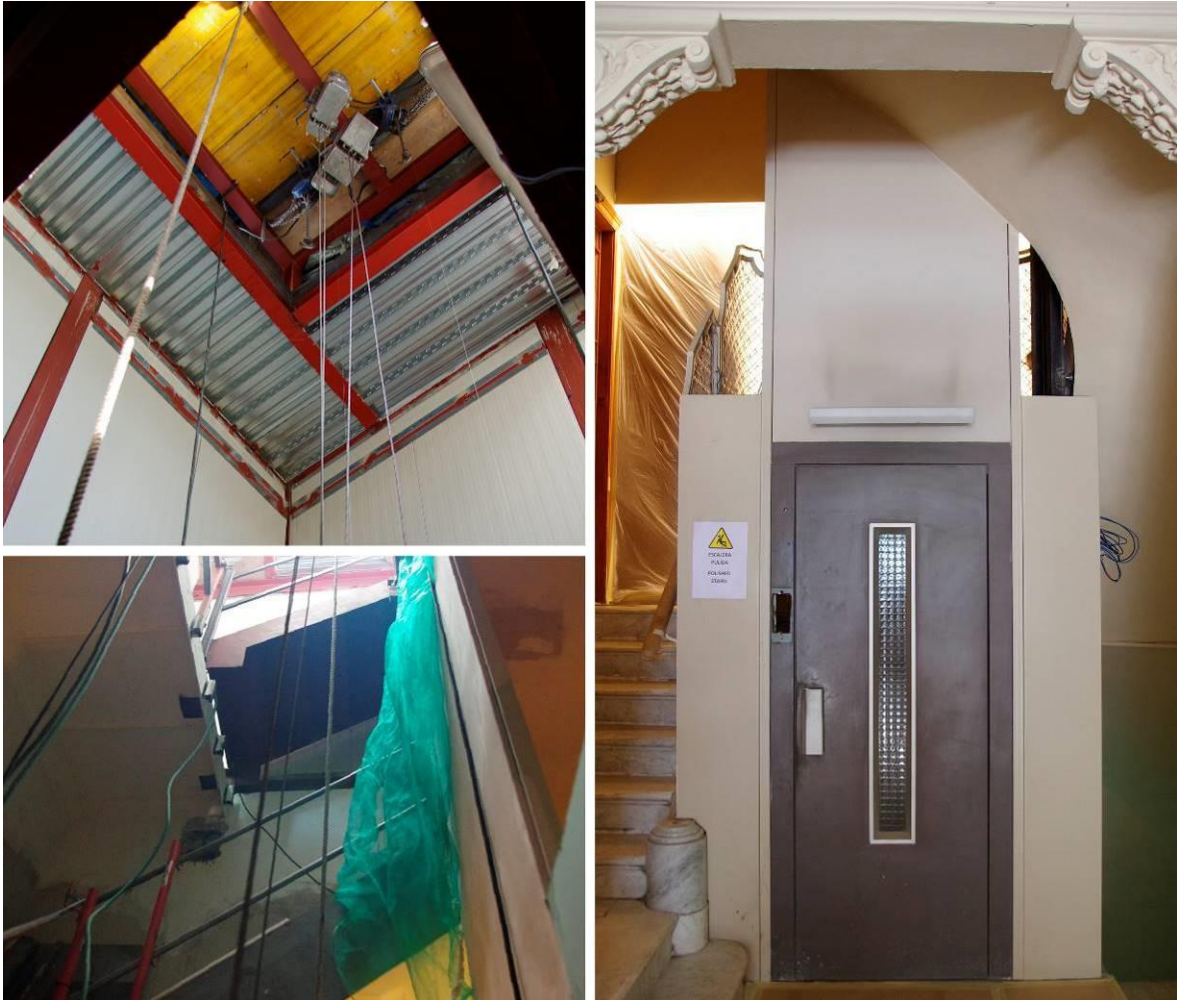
Upper left: Temporary structure and installation of the new elevator's mechanics. Bottom left: New steel flight of stairs being installed. Right: Elevator ground floor entrance inside the void of the staircase. Pictures captured at Valencia 247, May 29 2018.
